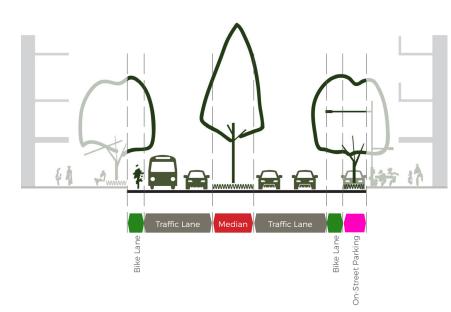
Typical Streetscape Cross Section for reference- Carriageway
